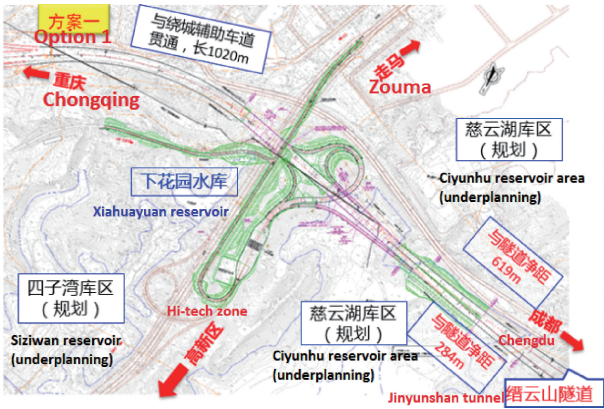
Layout plan of K-line Zouma Interchange (Option 1)
